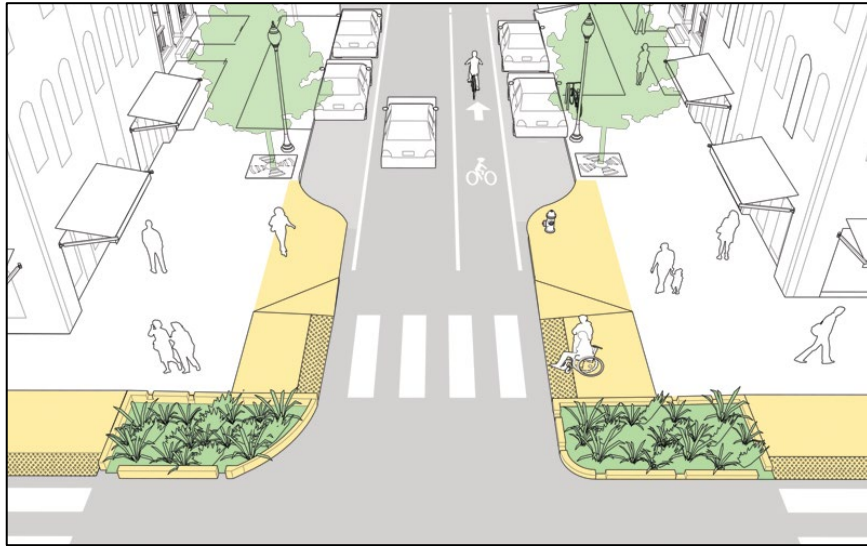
Example Corner Bump-outs at intersection (Source: NACTO Urban Street Guide).
